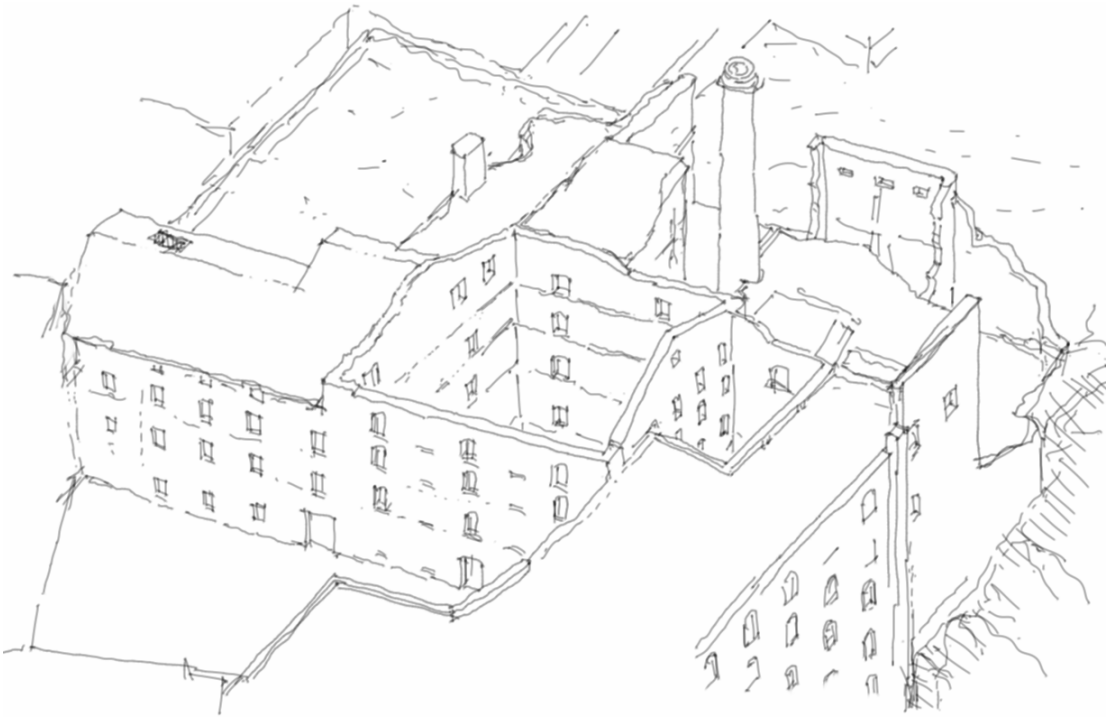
Building shell. Drawing analysis of bird's eye view looking west.
